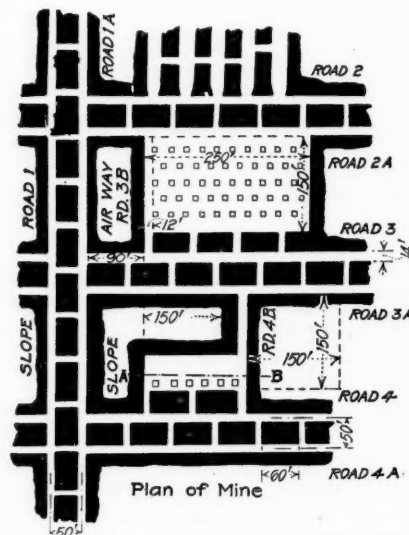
TYPE OF MINING WHERE CONVEYOR IS EMPLOYED
